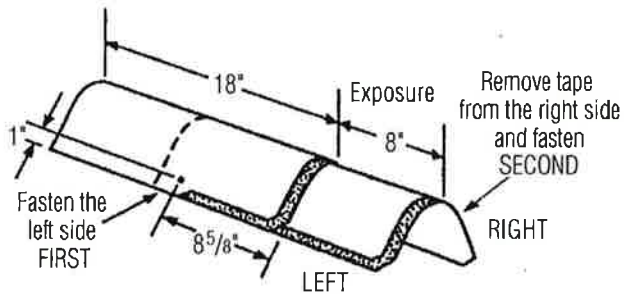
Installation of Shangle® Ridge shingles on hips and ridges.
